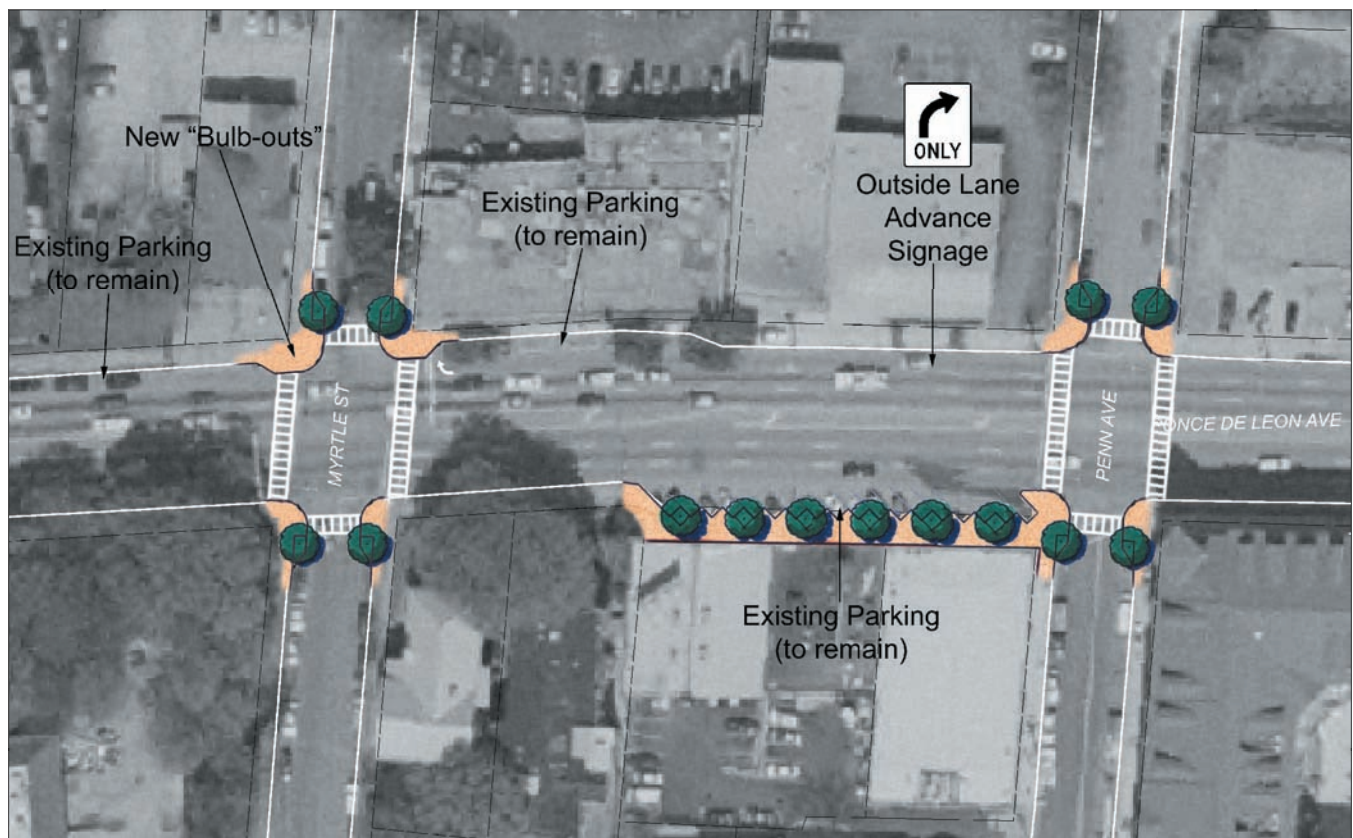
Recommended streetscape between Myrtle Street and Penn Avenue
